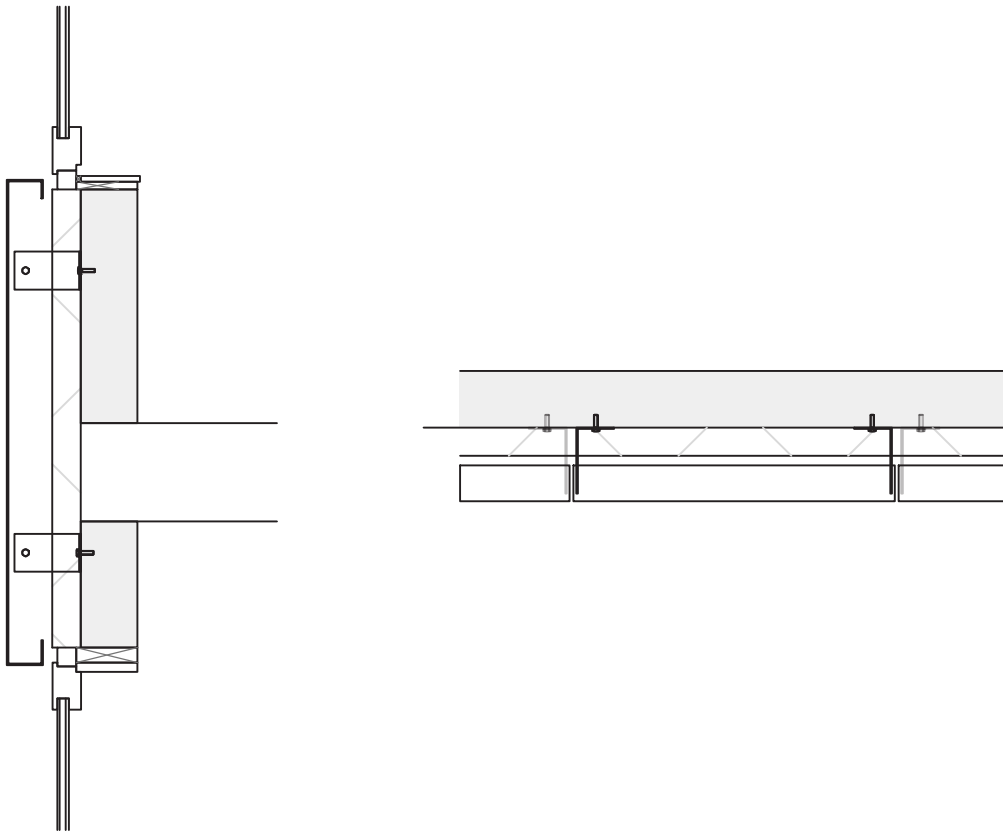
| 1:20 Section and top view of the *existing facade panel*. | Source: Own work
